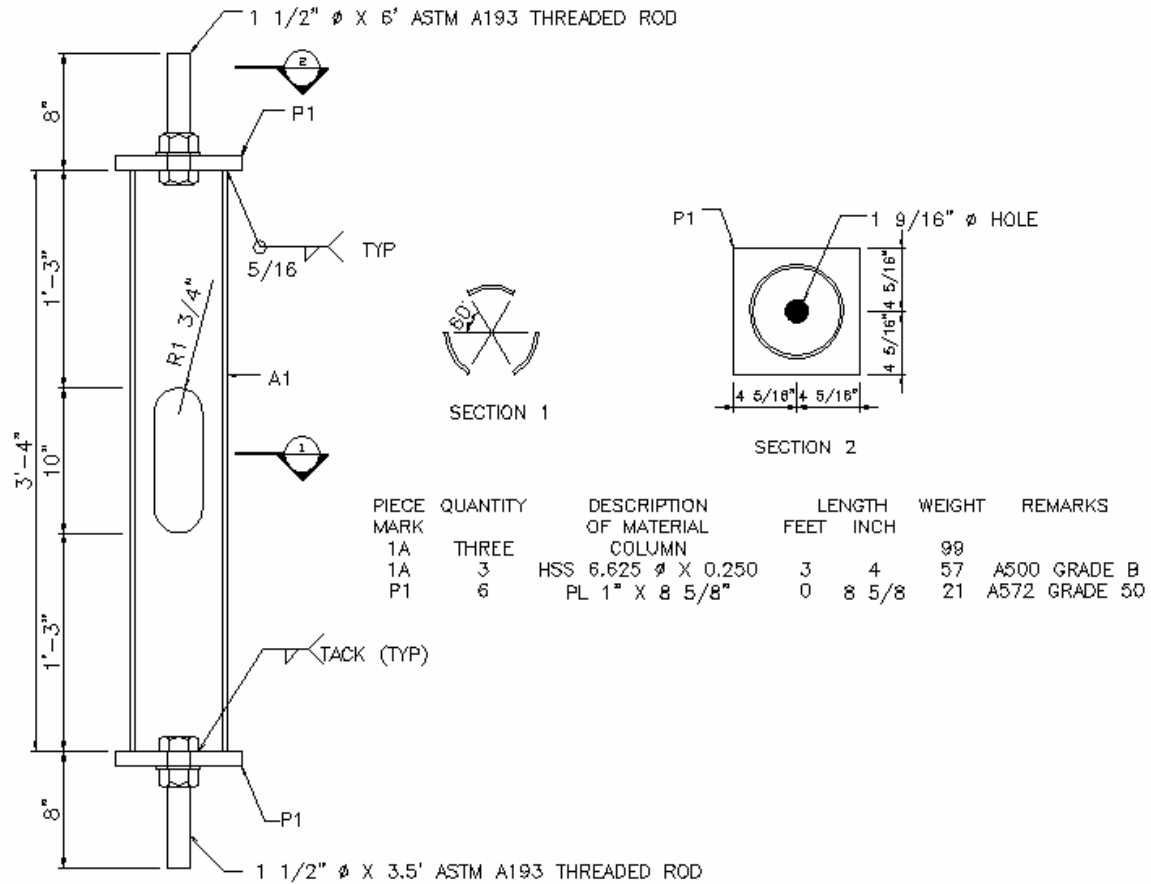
CYCLIC LOADING TEST SPECIMEN
